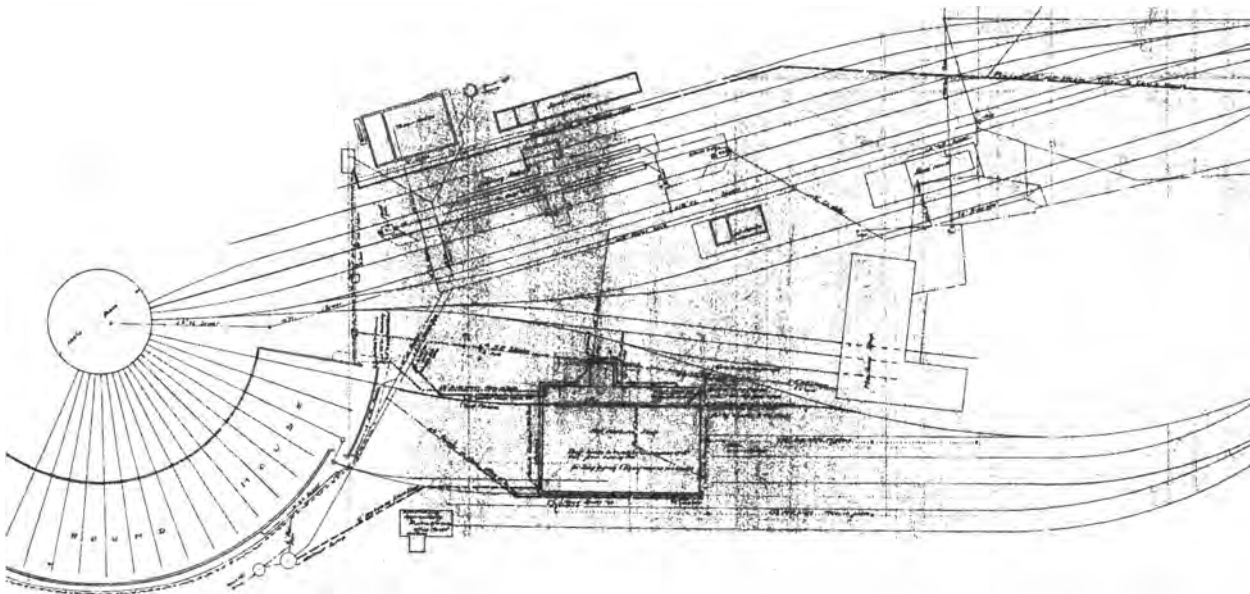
Evanston Railroad Complex Site Plan, 1917.
